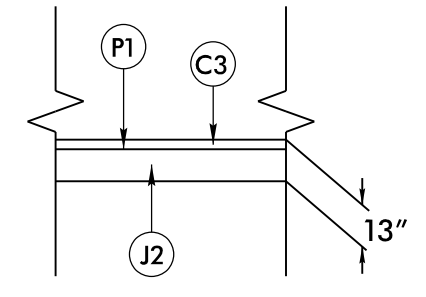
TEMPORARY CROSSOVER PAVEMENT
